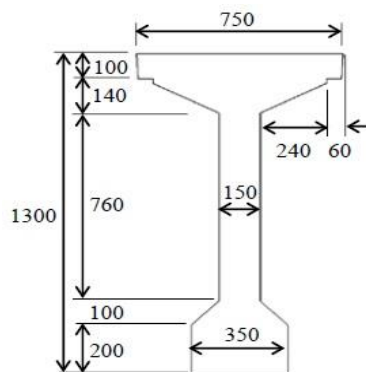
Cross section of longitudinal girders from previous study [14]
